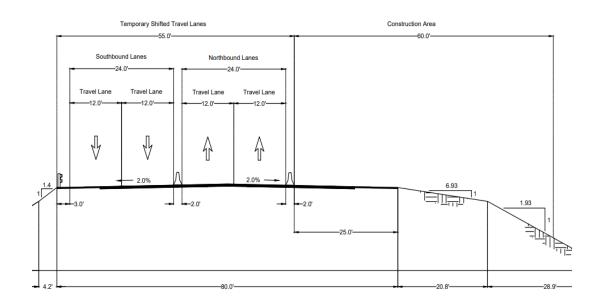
Typical phase one (1) cross section of proposed lane configuration on Highway 17.
